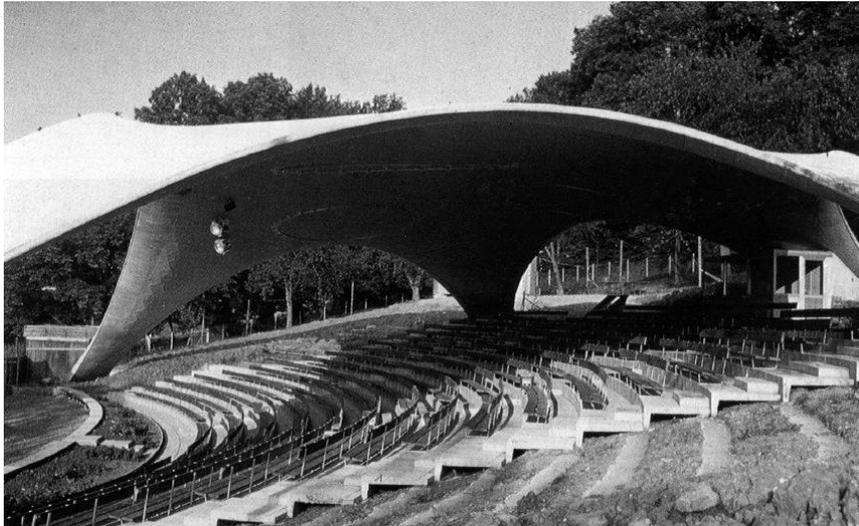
Concrete shell made by Heinz Isler [19]
